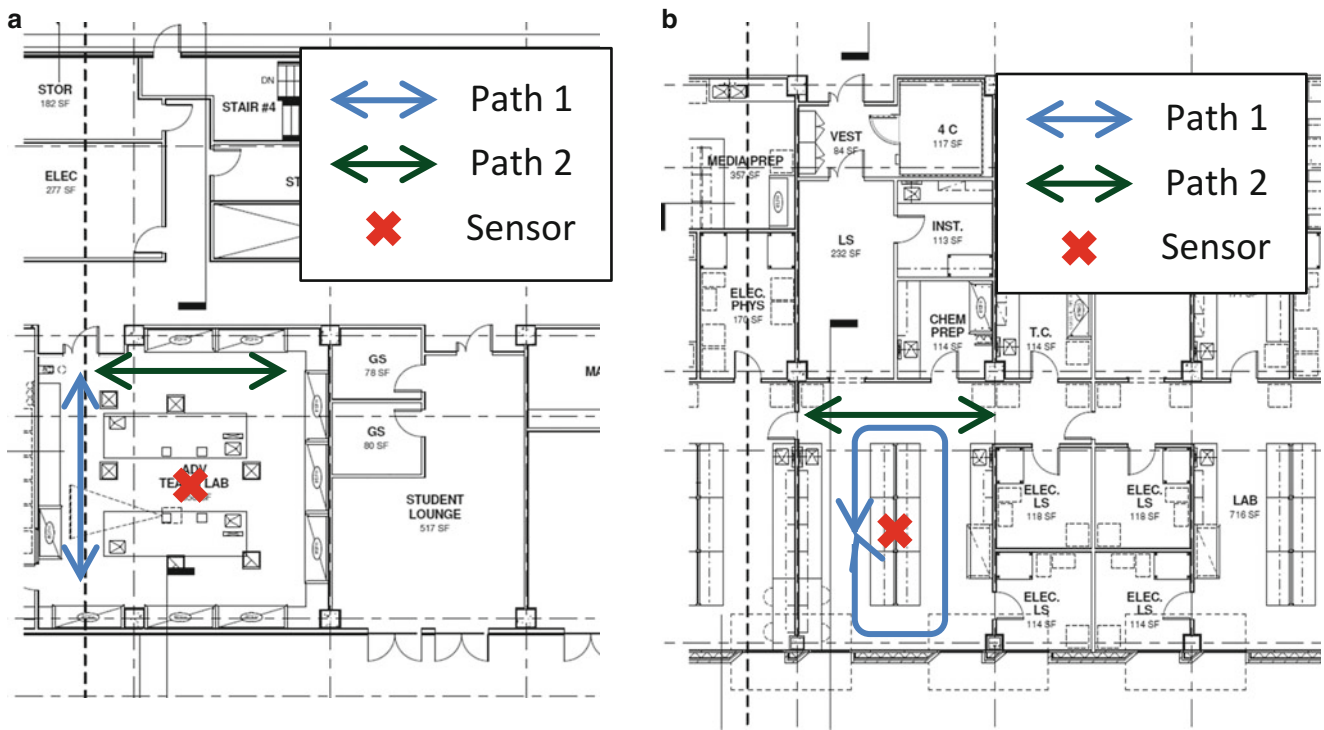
Walking paths for concrete structure, (a) site 1, (b) site 2
